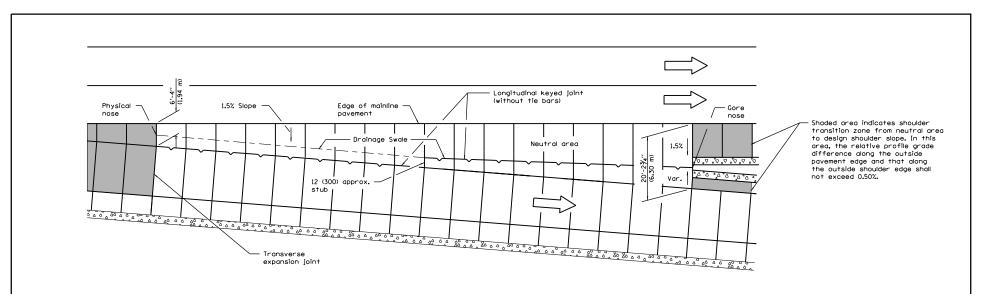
DETAILS FOR DRAINAGE IN NEUTRAL AREA
